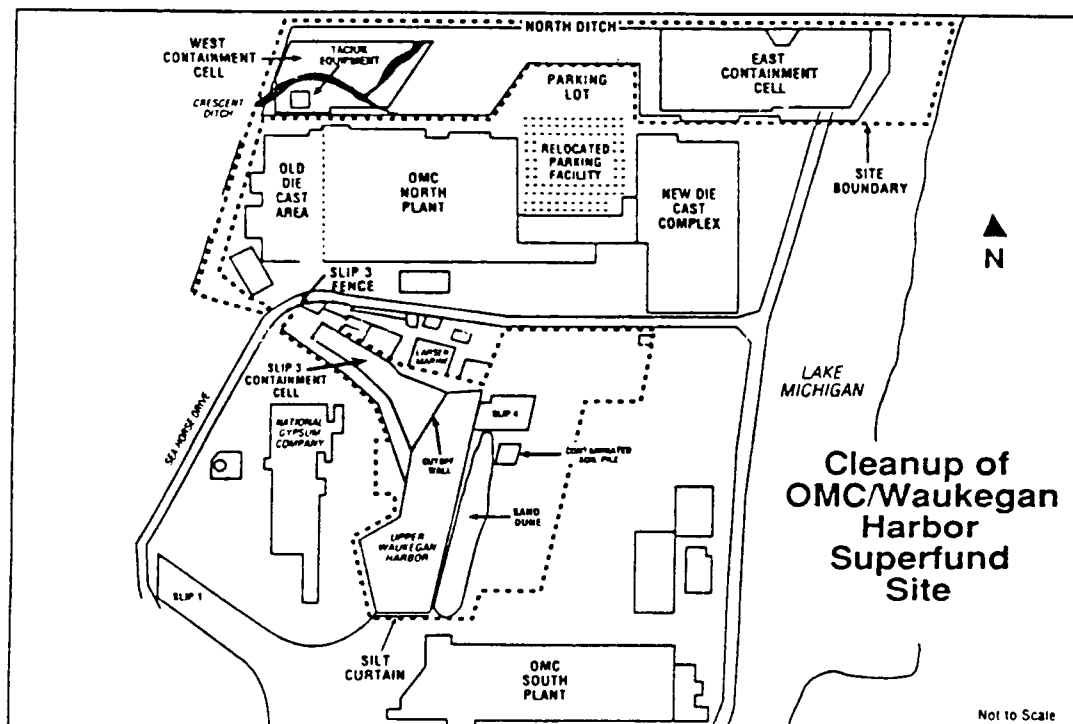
B Site Plan of OMC/Waukegan Harbor Superfund Site
